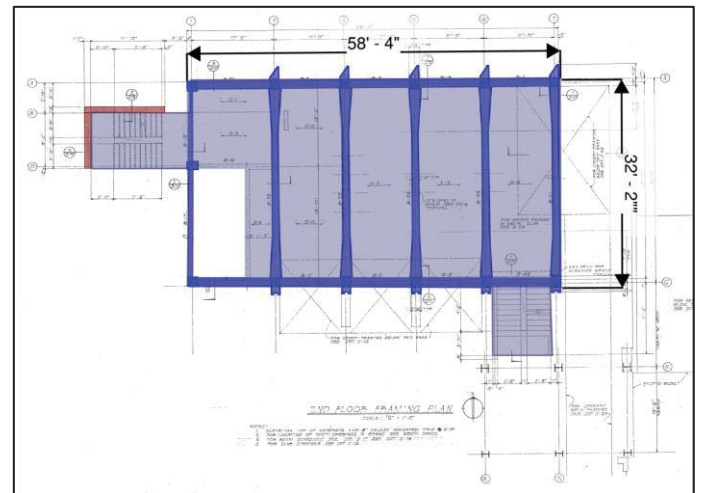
Typical floor plan showing locations of concrete moment frames (in blue) and concrete shear walls (in red).
